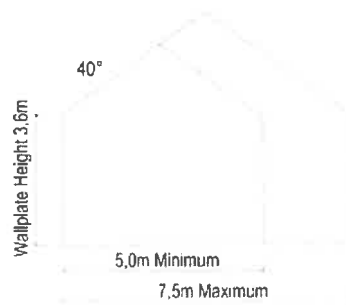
Section illustrating prescribed height for a Type I Erf Building
